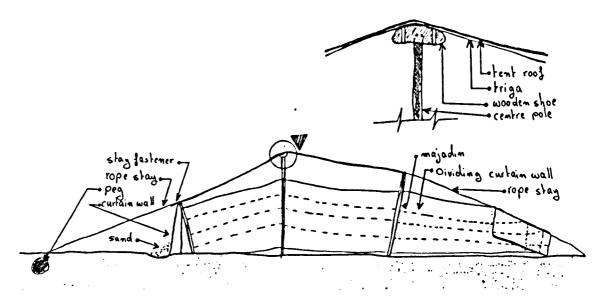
A sketch that shows a transversal section passing through the tent, and parallel to the dividing curtain wall (7).
